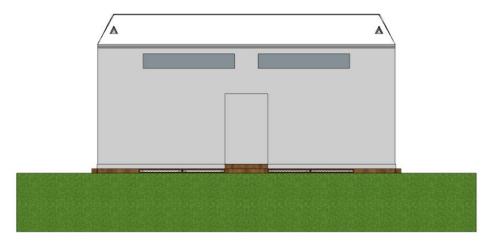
2D sketch showing typical elevation without chimney reinforcement
